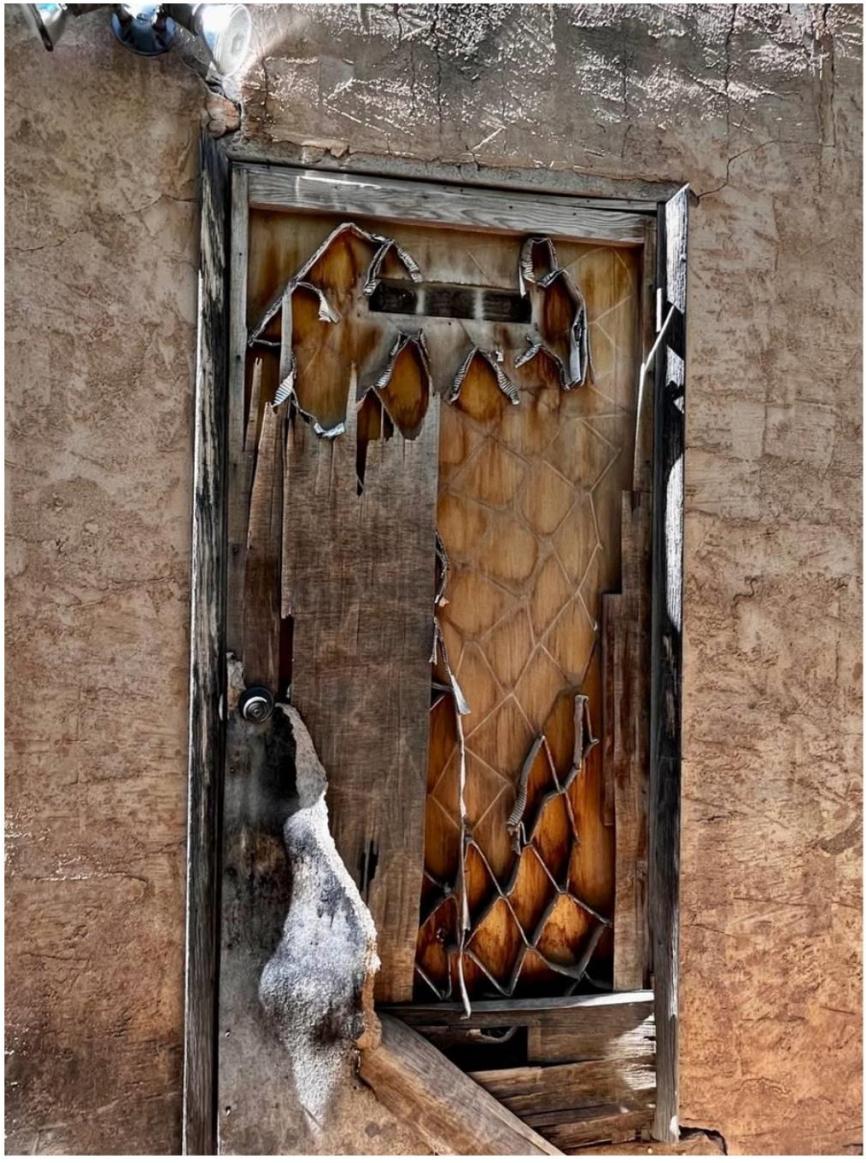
East elevation at Bedroom Wing Addition. Camera facing west.
